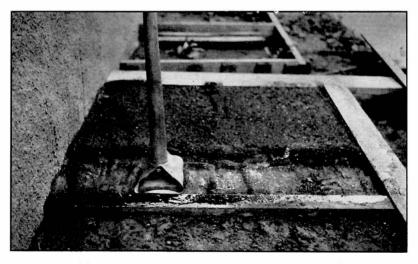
TOO MUCH OIL WAS USED IN THIS FLOOR.
